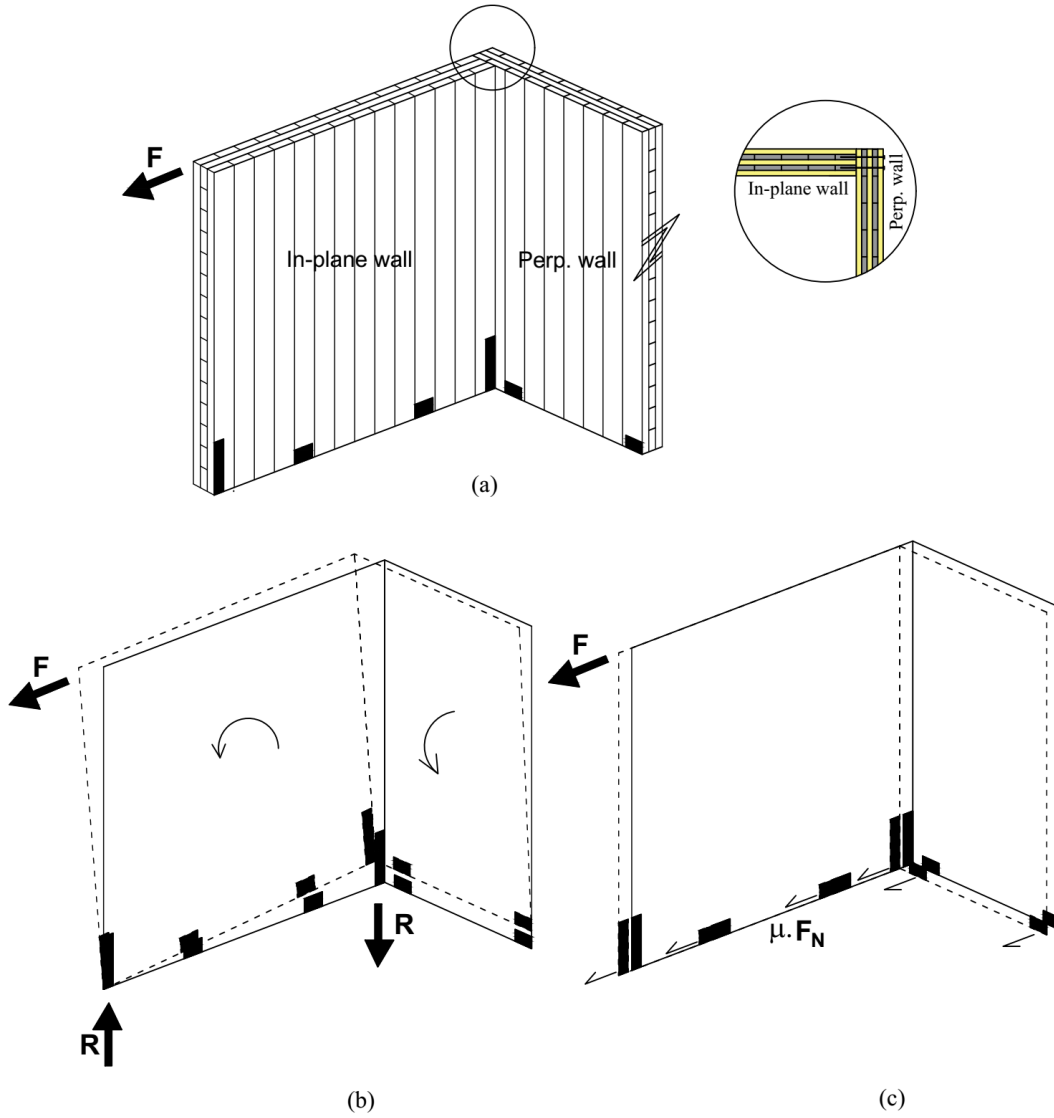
(a) CLT shear wall with perpendicular wall in configuration 2, (b) walls under rocking, and (c) walls under sliding
